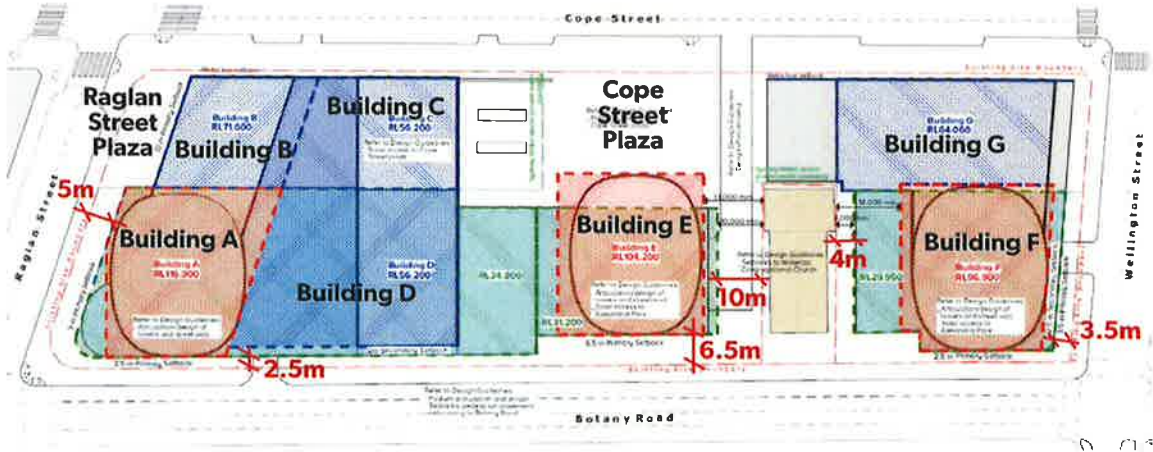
| Building Envelope Plan (Source: Applicant's RTS)
